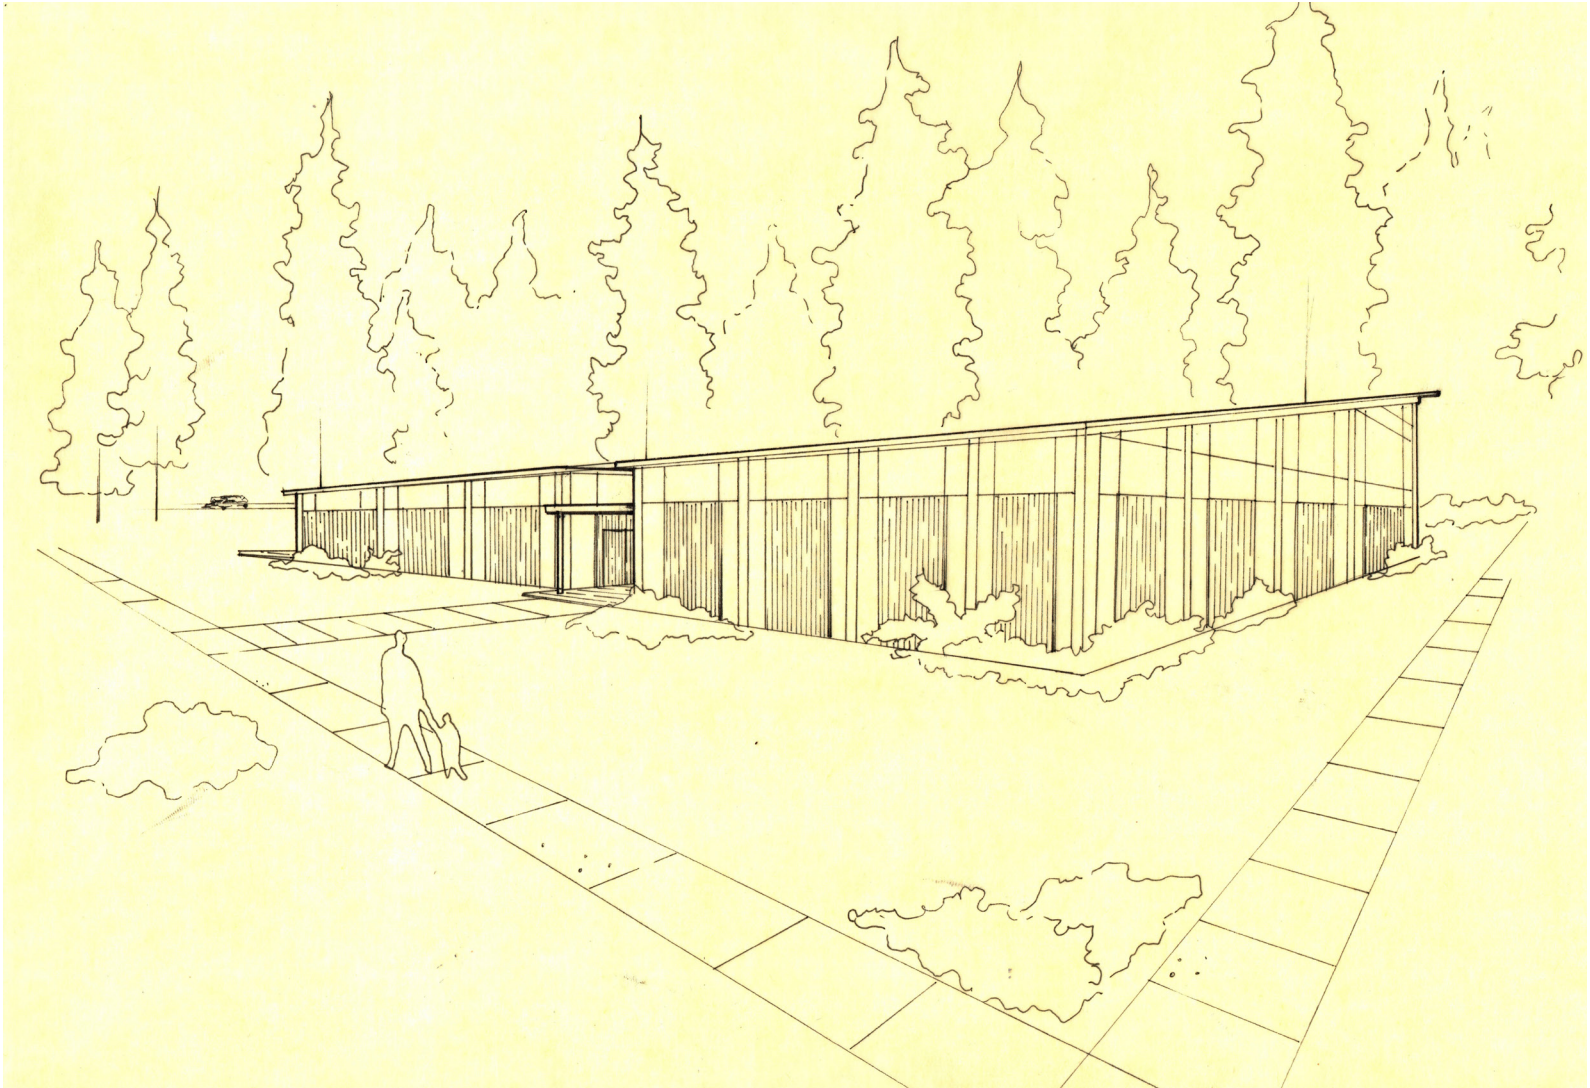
Threshold Building, Final Perspective, Approaching East Facade
